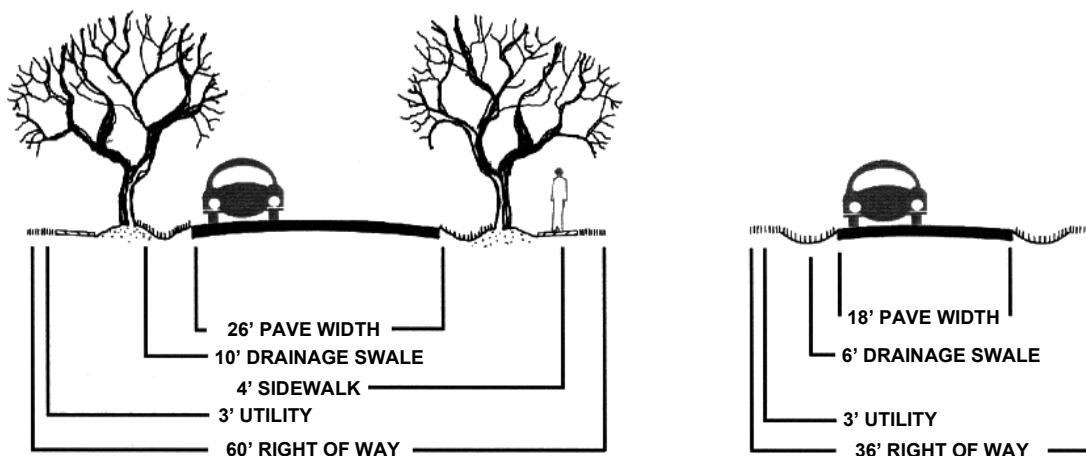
Potential Design Options for Narrower Roadway Widths
